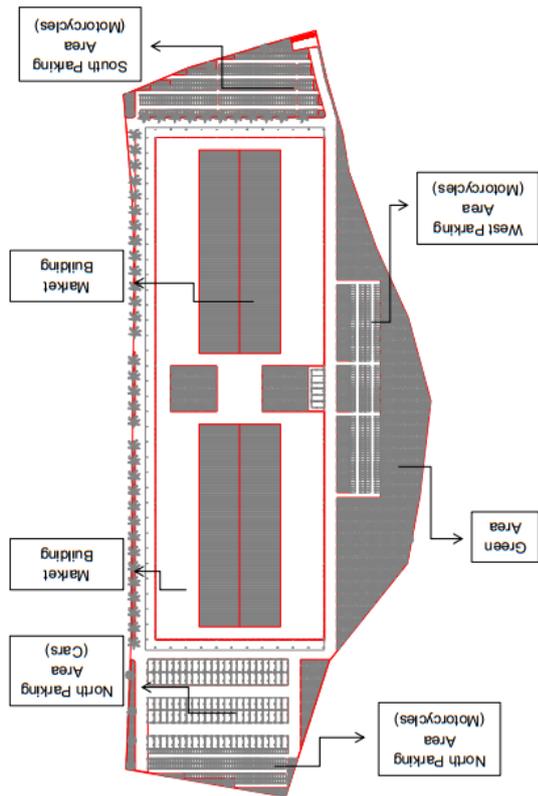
Site Plan Of Pasar Kepuh in Kuningan District
